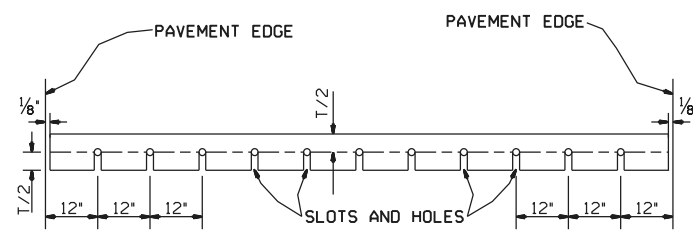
DETAIL OF JOINT SUPPORT FOR EXPANSION JOINTS
